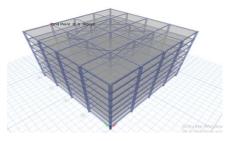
G+6 Building with X-Bracing walls on inner peripheral walls.
